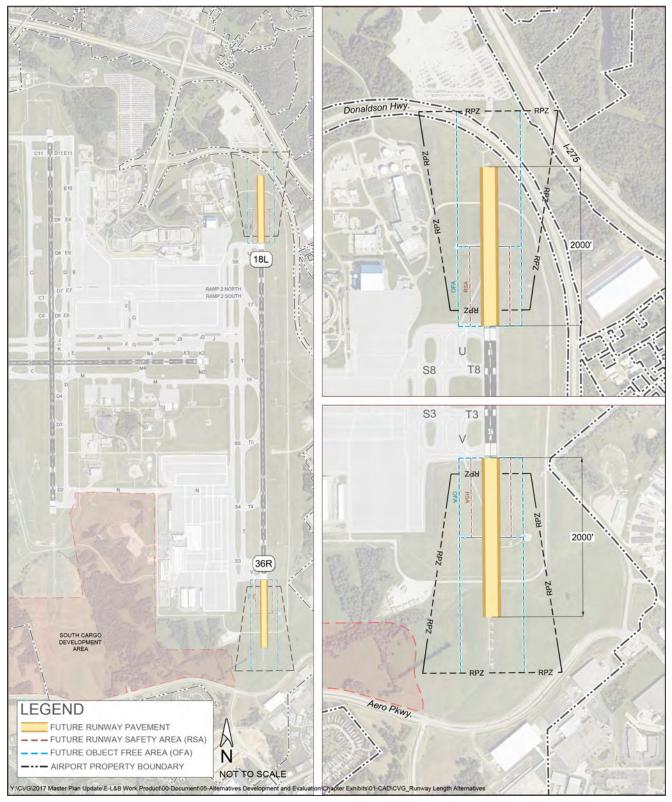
12,000 FOOT RUNWAY 18L/36R – ALTERNATIVE 7
